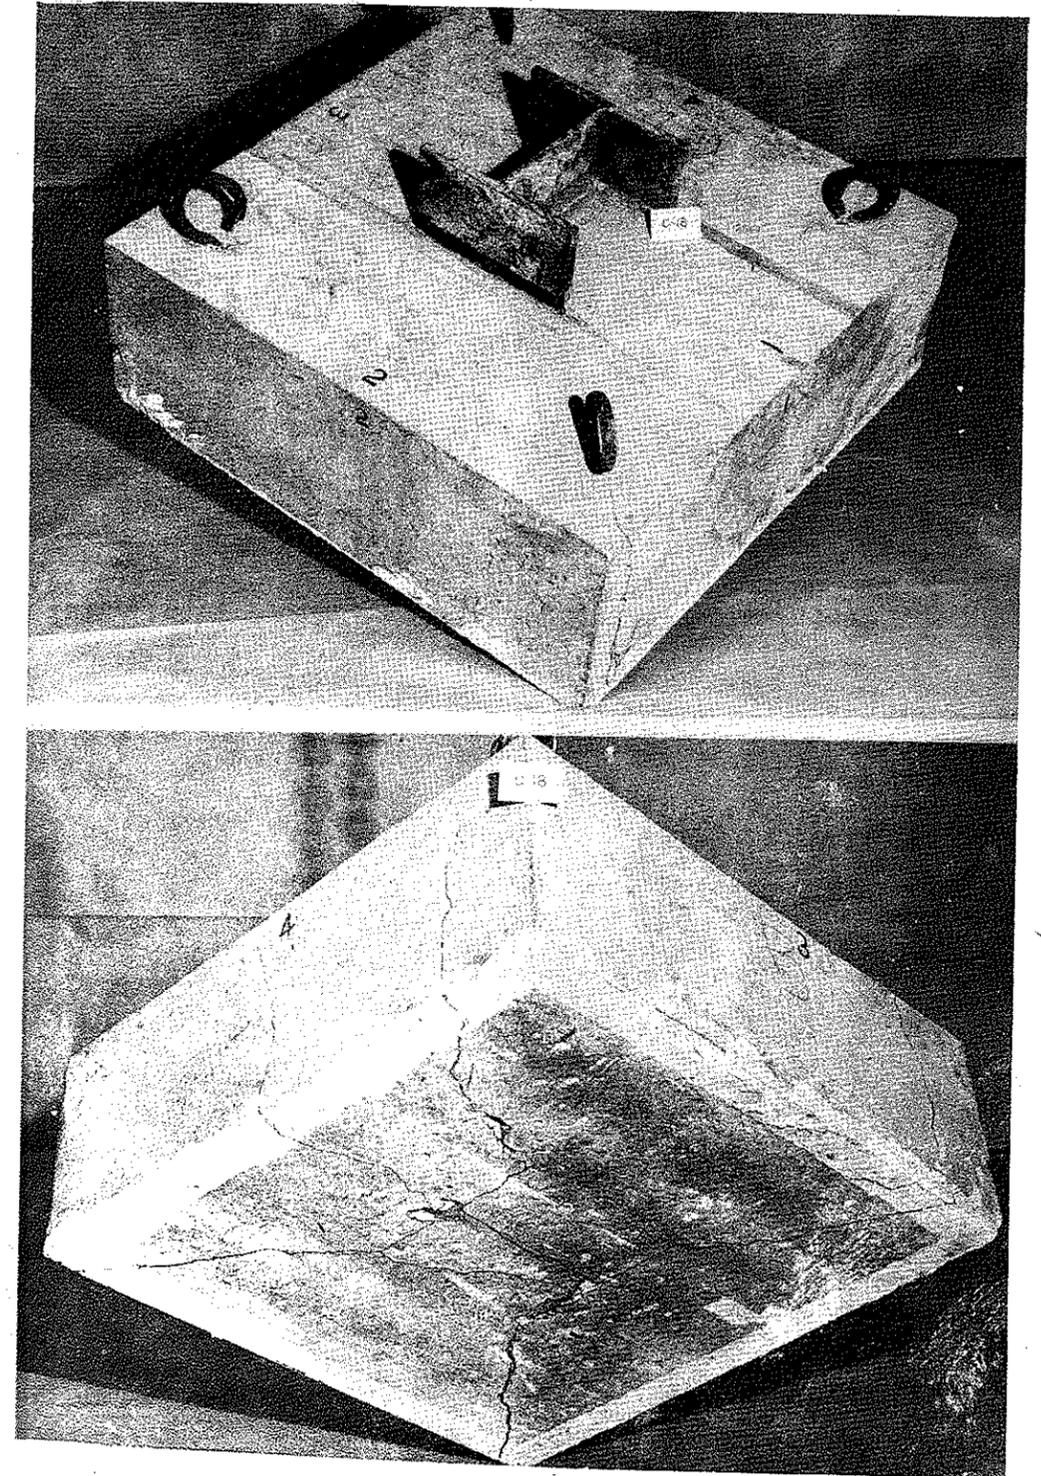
APPEARANCE OF SPECIMEN C-18 AFTER TESTING
